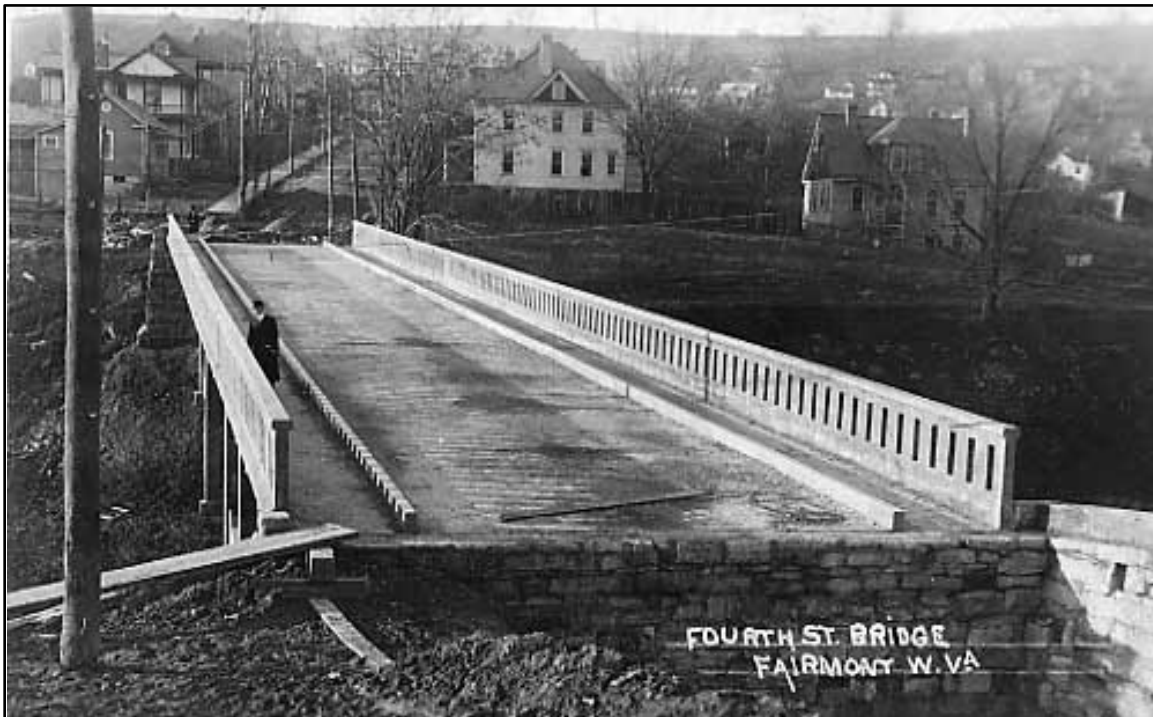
Circa 1912 postcard showing SE bridge abutment under construction.
